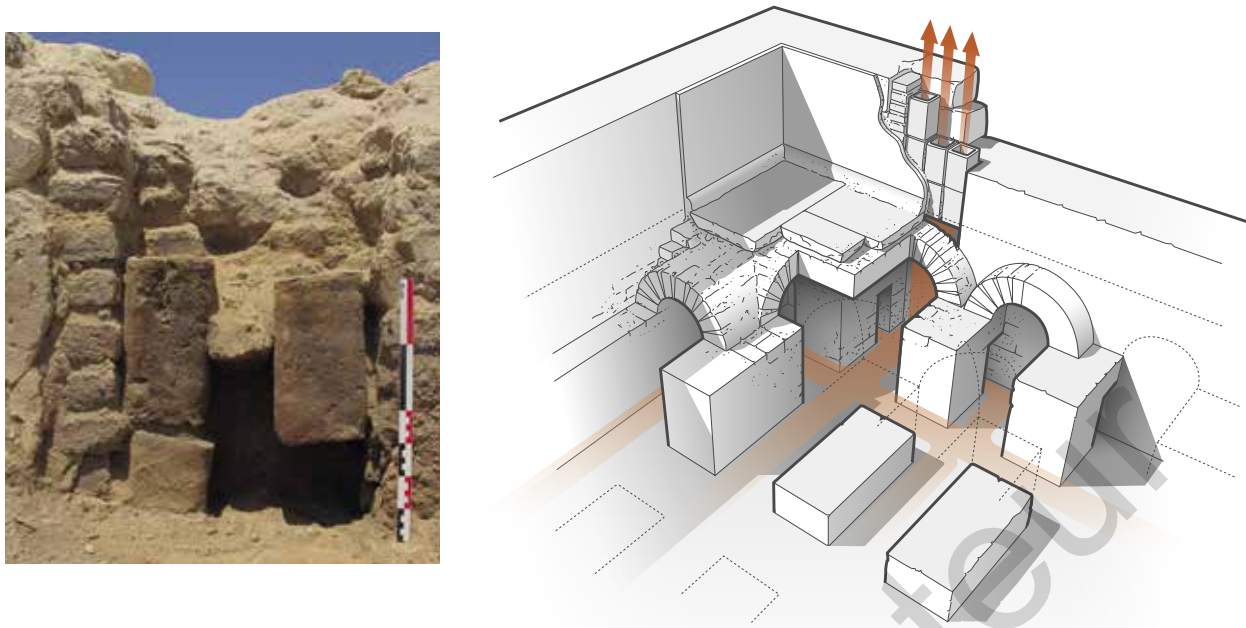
Chimney flues (*tubuli*) built in the wall (Taposiris Magna Byzantine baths, photo M. El Amouri 2013), and perspective reconstruction of the connection between hypocausted floor and wall heating system of Mareotic baths (Th. Fournet).
